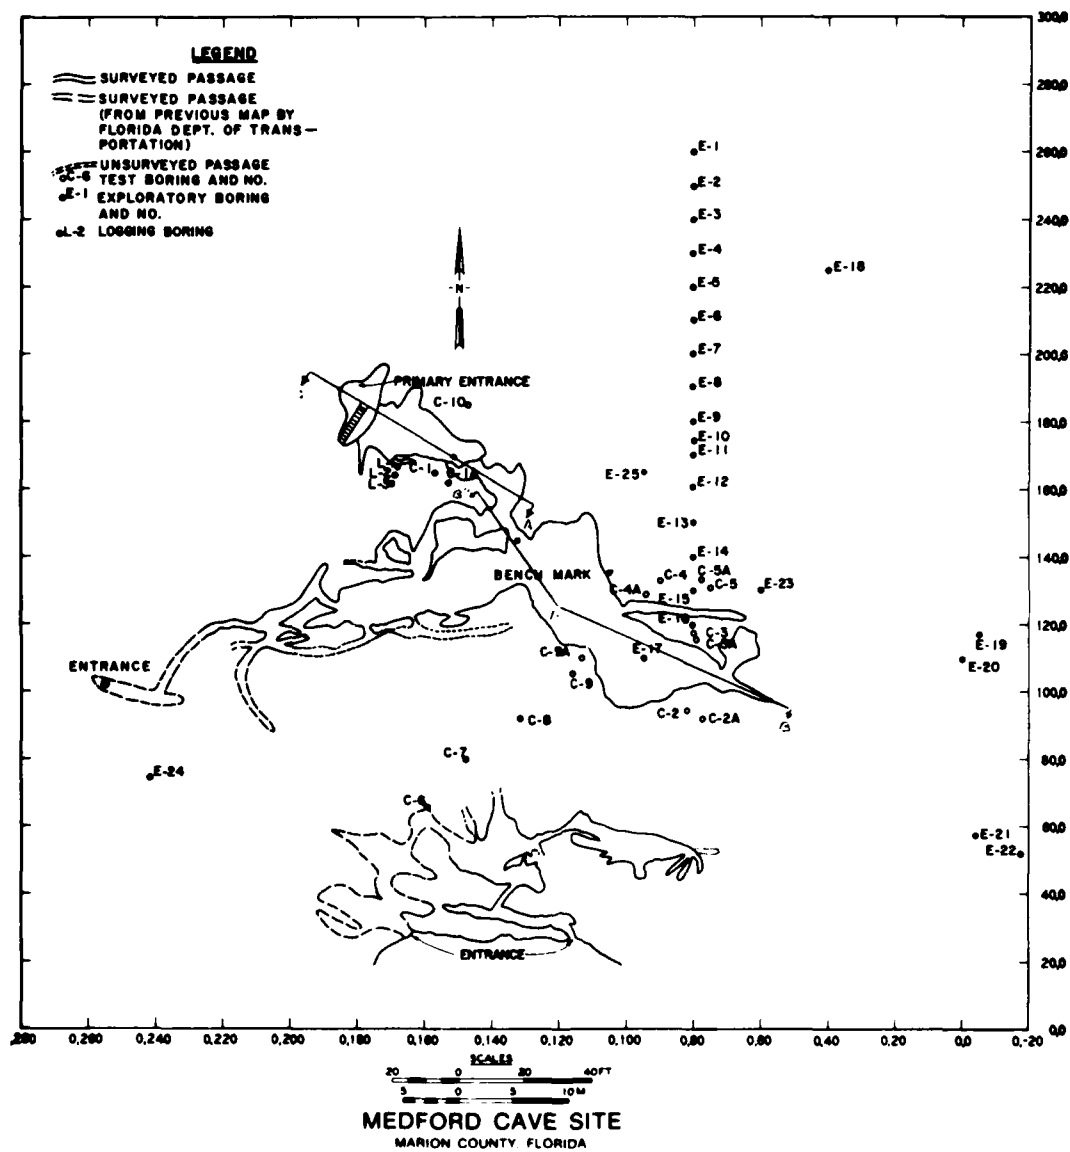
Plan view of the Medford Cave test site showing cavity system, boring, and profile locations
